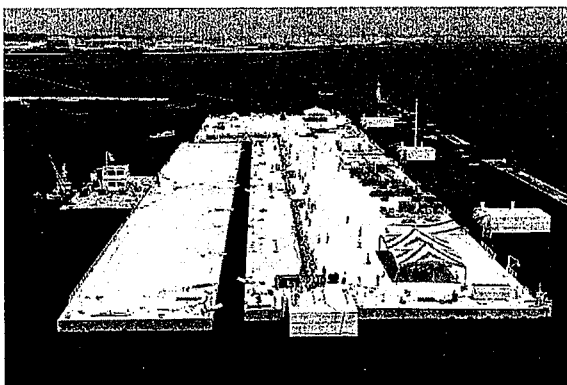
Ultra-large floating structure work method verification experiment<sup>9)</sup>
